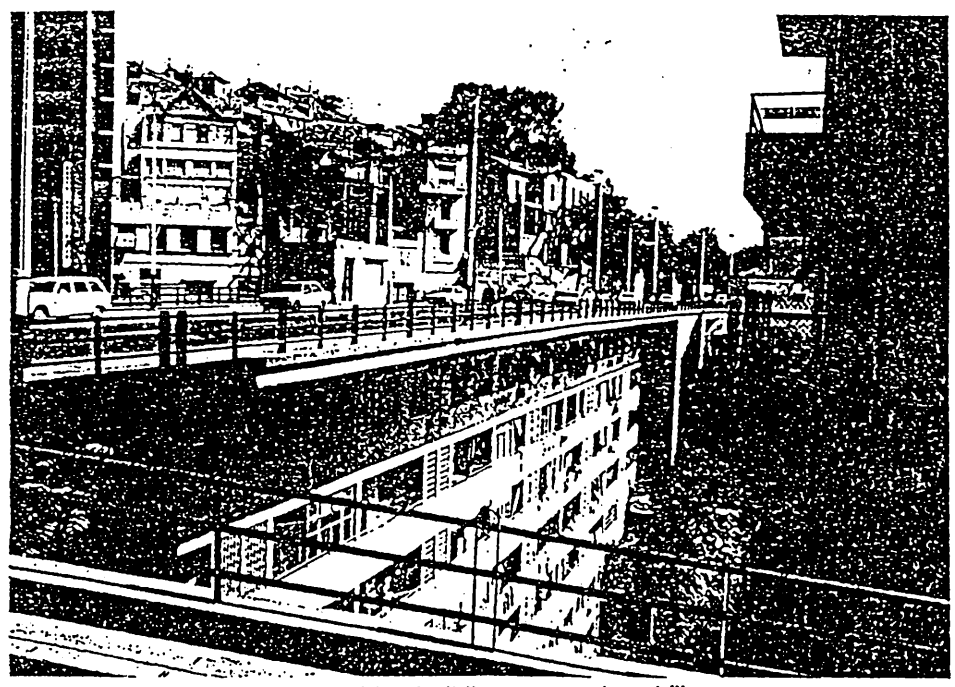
A bridge building as an adaptability solution to the hilly site of Algiers.
